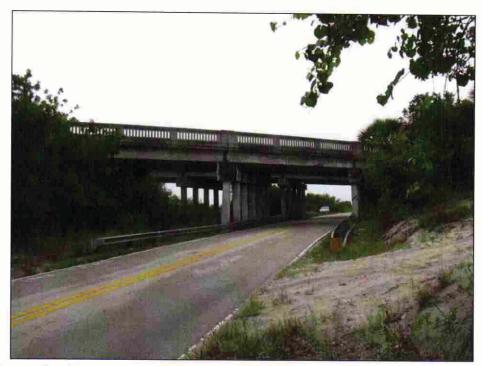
Old Dixie Highway (8IR1519), Facing South toward Bridge #880001
